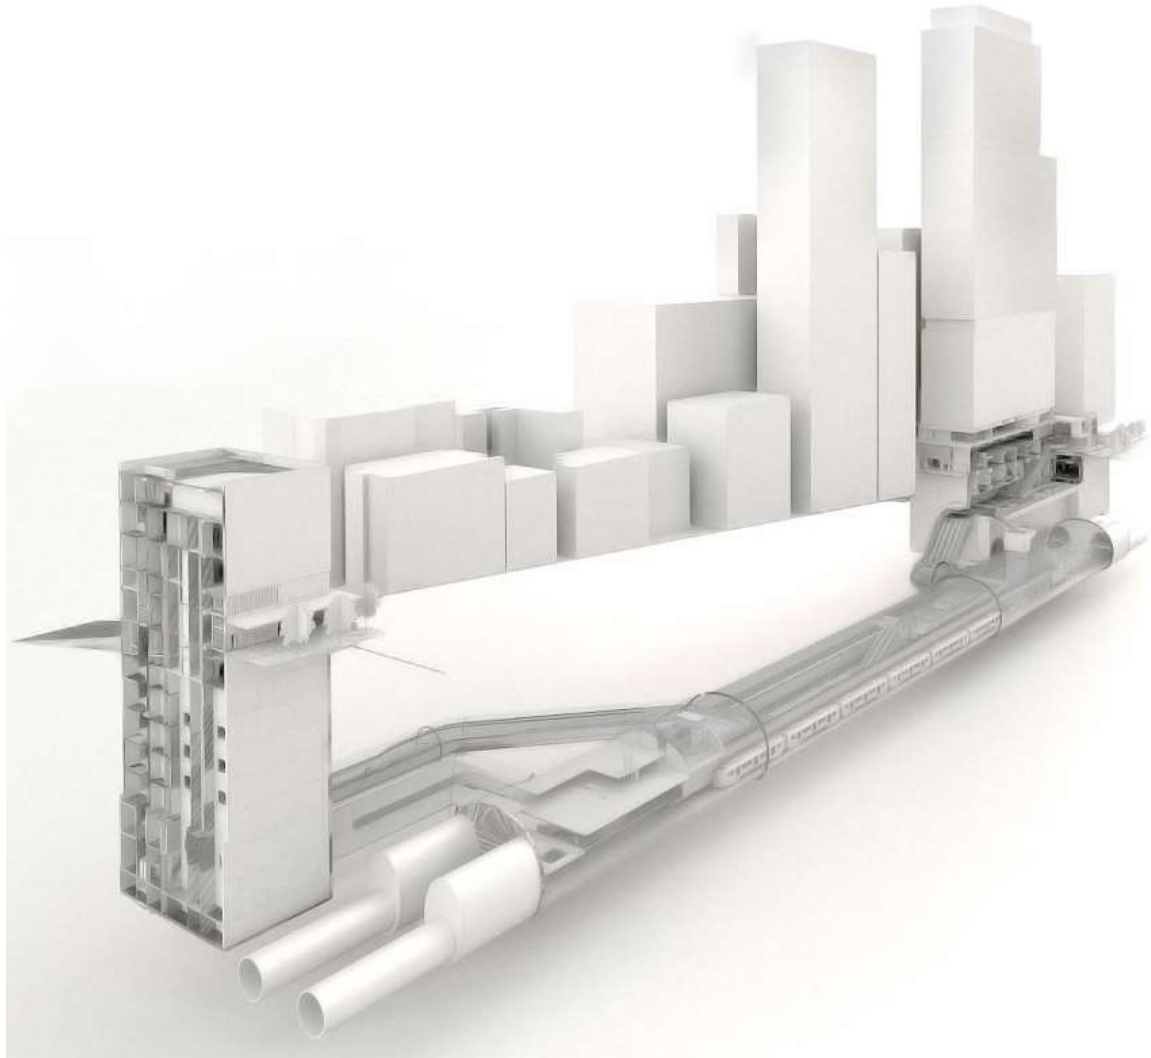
Victoria Cross Tunnel and Station structure perspectives describing an integrated design from foundation level to rooftop including a view of the new tunnels adjacent the shaft and the foundation soffits.
